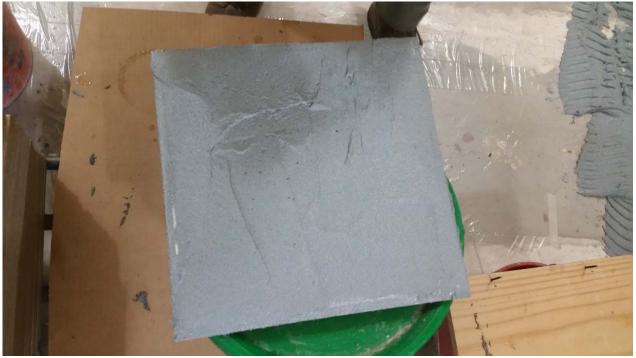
Typical application of mortar to rear face of tile prior to installation
